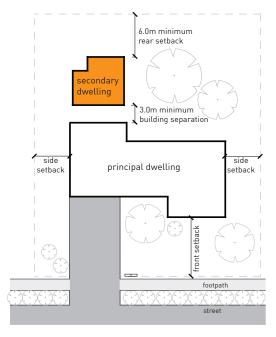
F.3-1: Setback controls for ground floor detached secondary dwellings.
